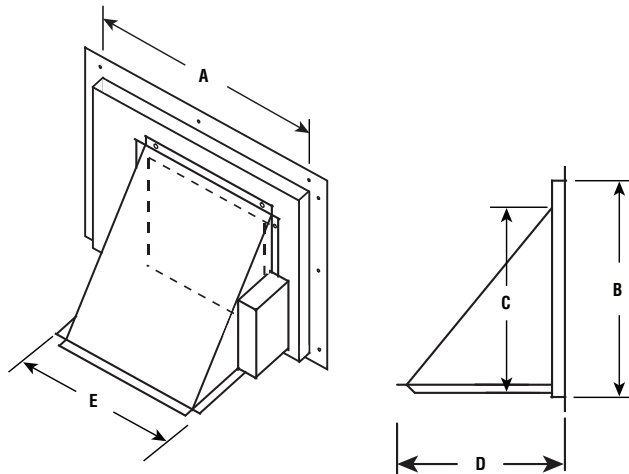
BAYOSAH001 and BAYOSAH002A outside air damper (Replaces filter/coil access panel)
